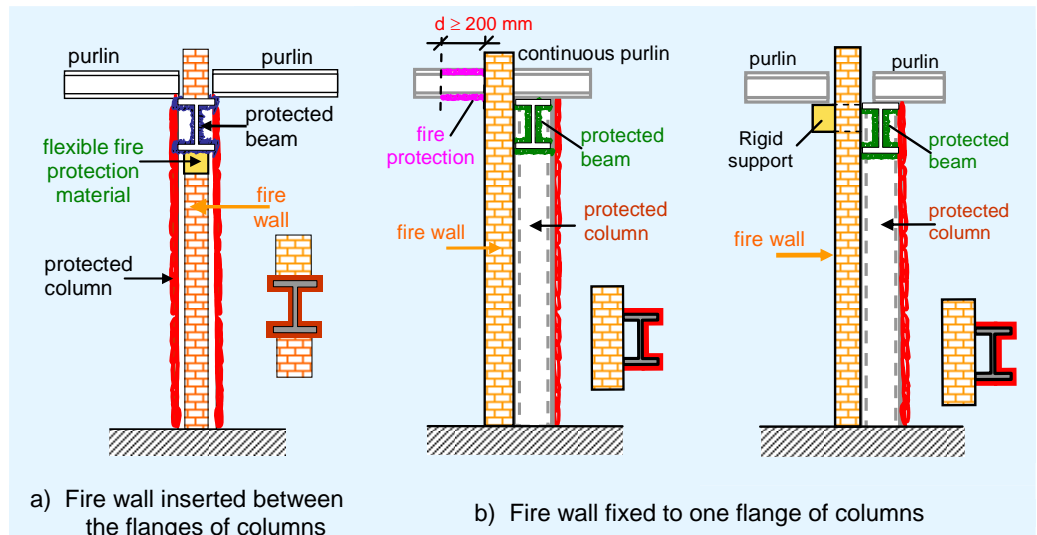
Design detail near fire walls parallel to portal steel frame
